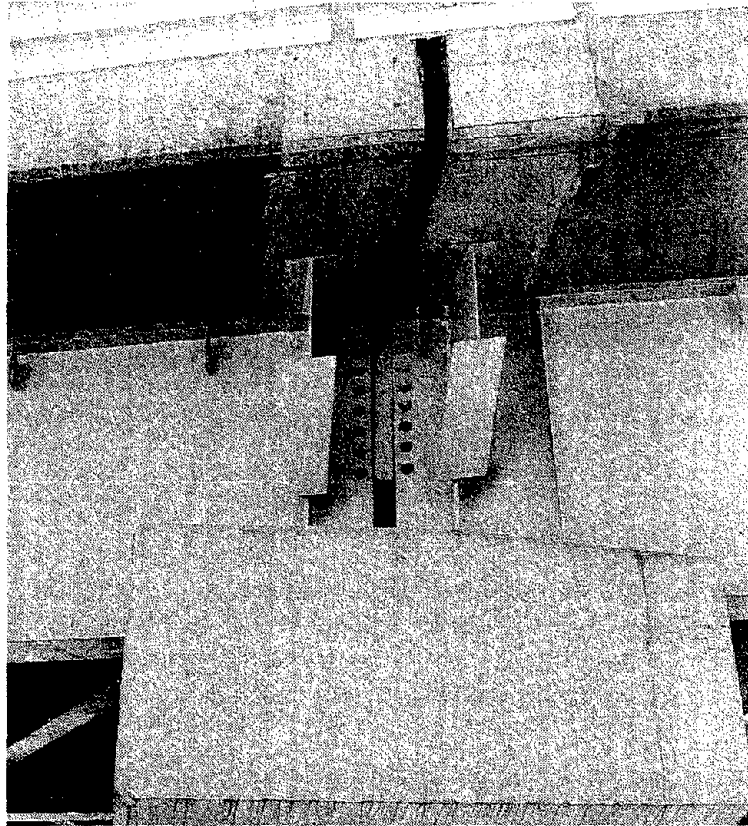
Damage of the Connection Devices (Hatsune Bridge)
